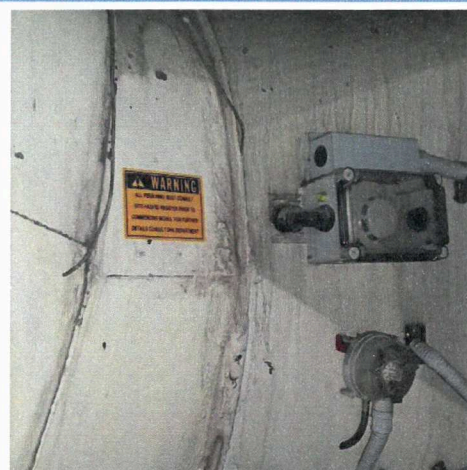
Level 9, South-West Plant Room, Hot Water Pipe - Gasket
